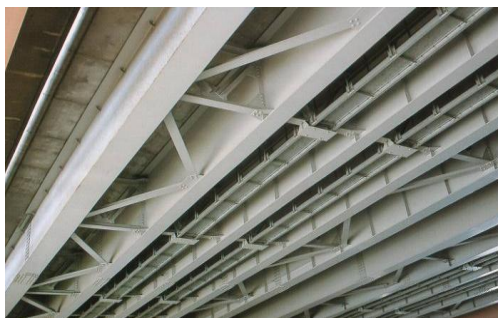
RC Floor Slab/Multiple Main Girder Photo 3. PC Floor Slab/Minimum Main Girder
